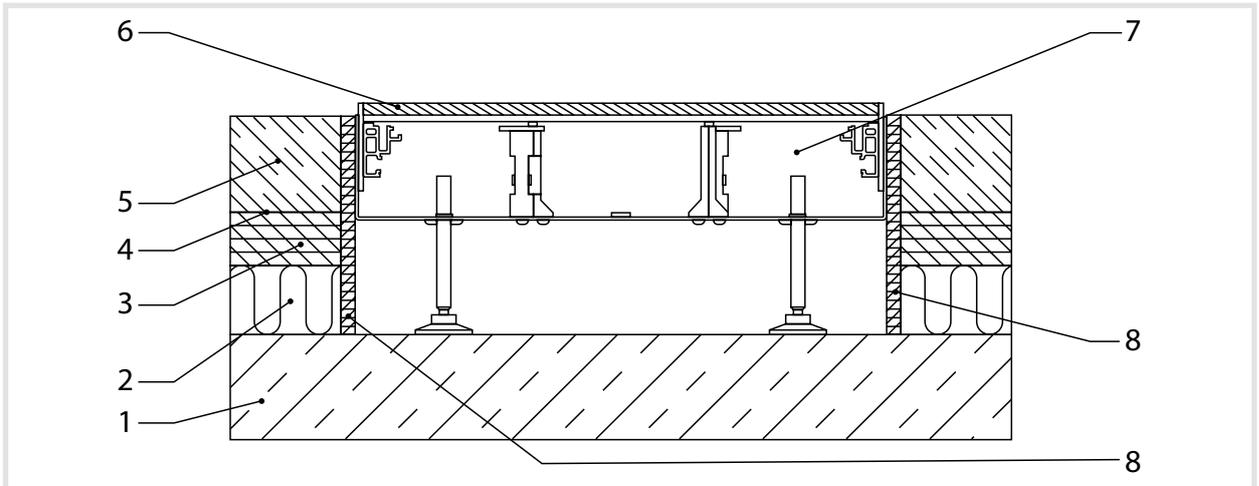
Concept drawing of the floor channel BKG30060 test setup in the ceiling test station
